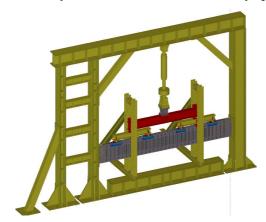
Spot-welded built-up corrugated web beam. Test setup.
